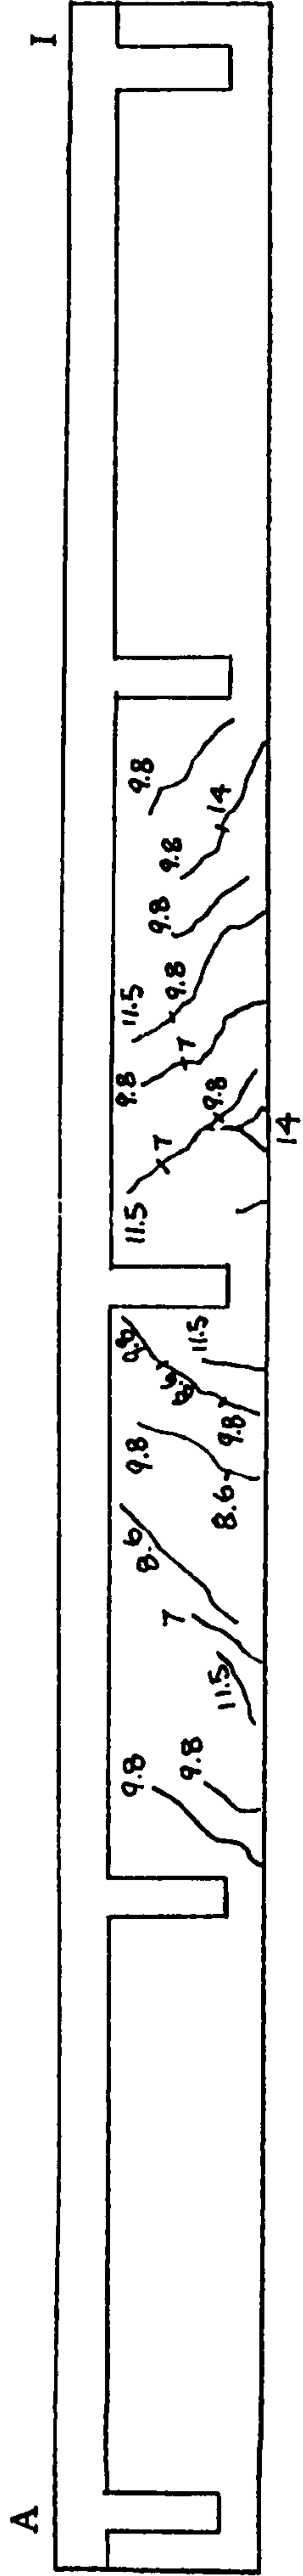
(b)-Crack Pattern on the Sides of Beam #2 of the Model Bridge Deck
